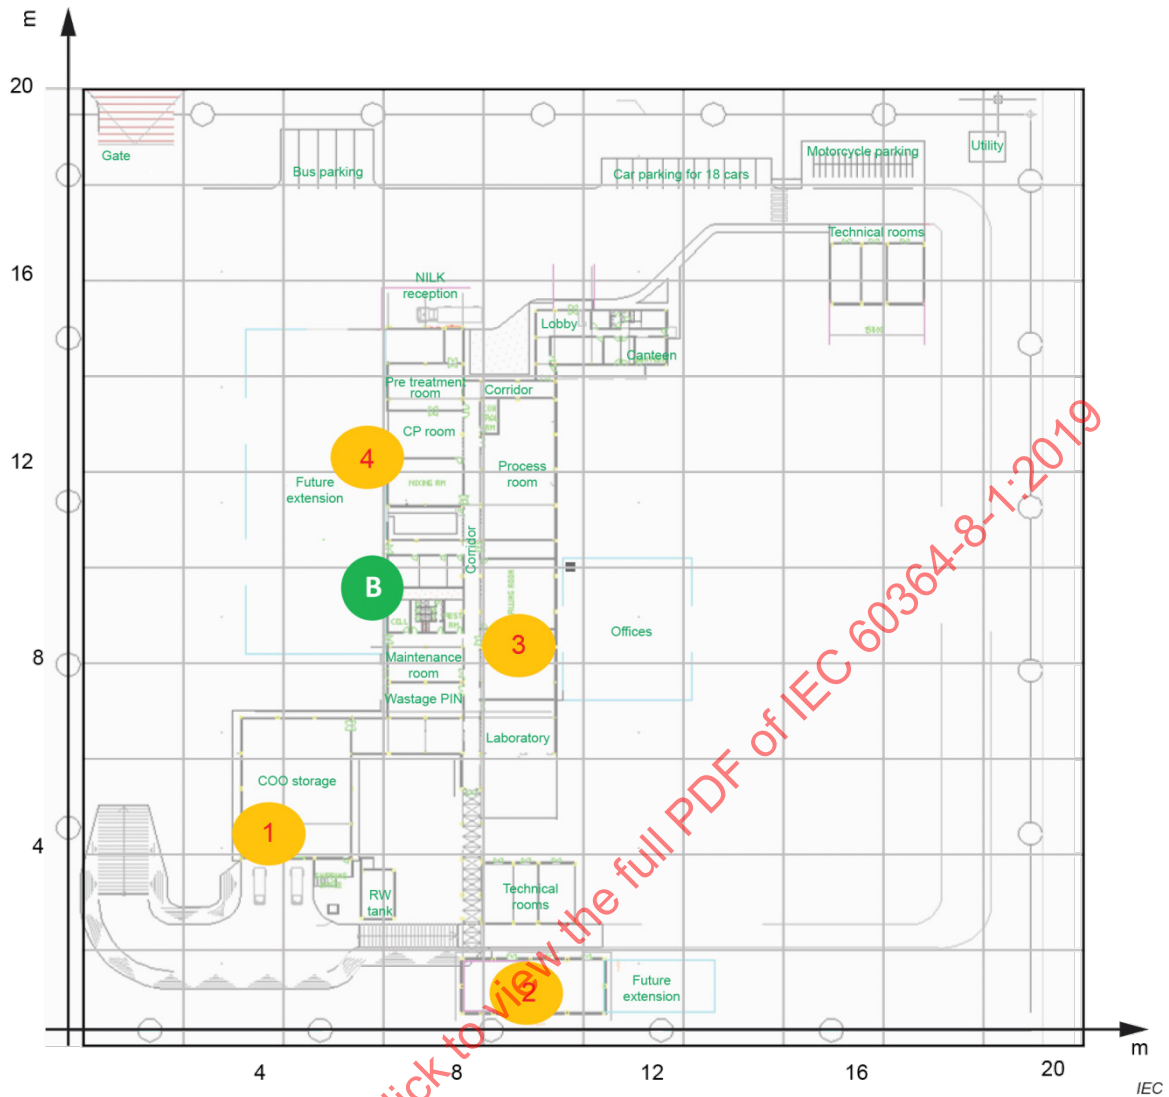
Example 1: floor plan of production plant with the planned loads and calculated barycentre
